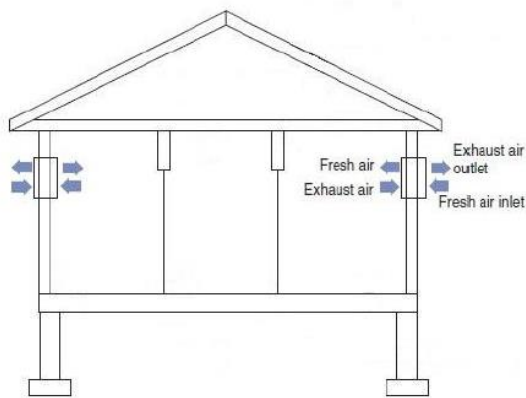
Principle of placement of Pair-Wise DV, section of a building (Magagna, 2016)
